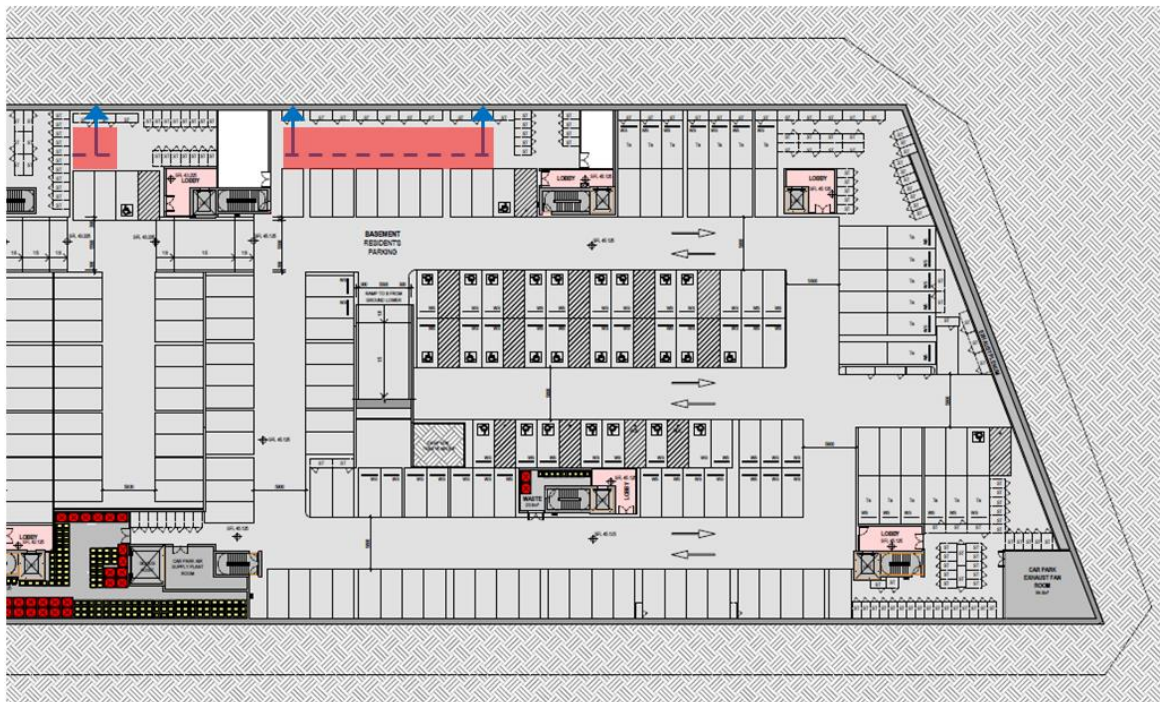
Extract from the Building C, D, F, G and H Basement Plan TP21.00 showing the extension of the basement to the north (shown in blue) and resulting resident storage areas (shown in red).
